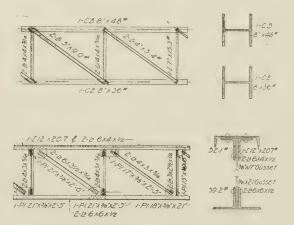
Welded and Riveted Typical Panels and Chord Sections Pratt Type Truss
